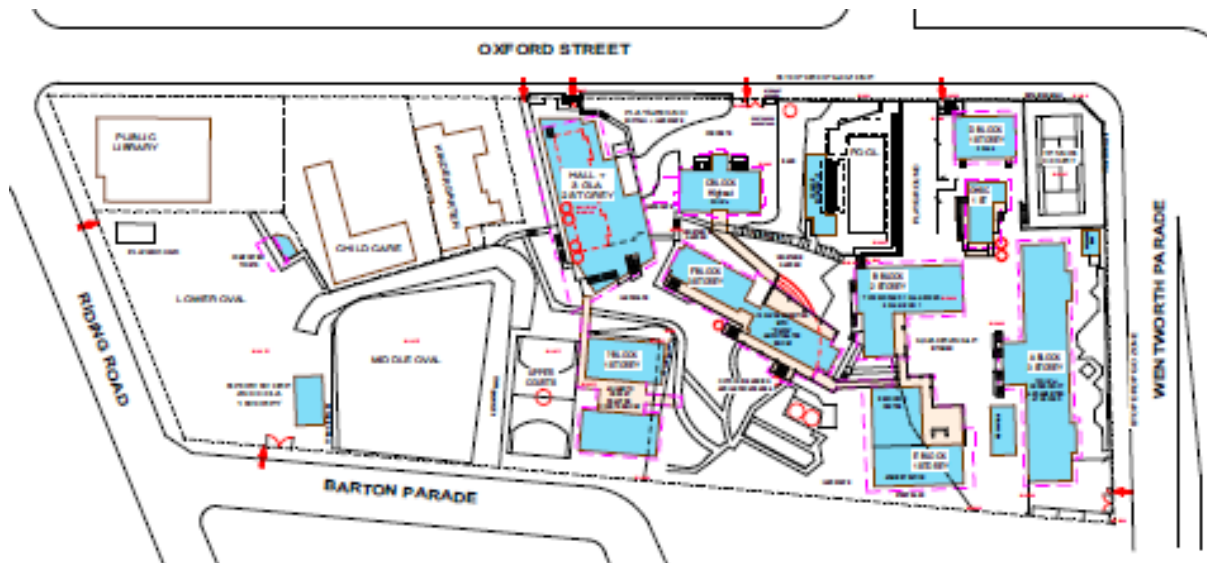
Site plan as existing prepared by Biscoe Wilson Architects 2015
